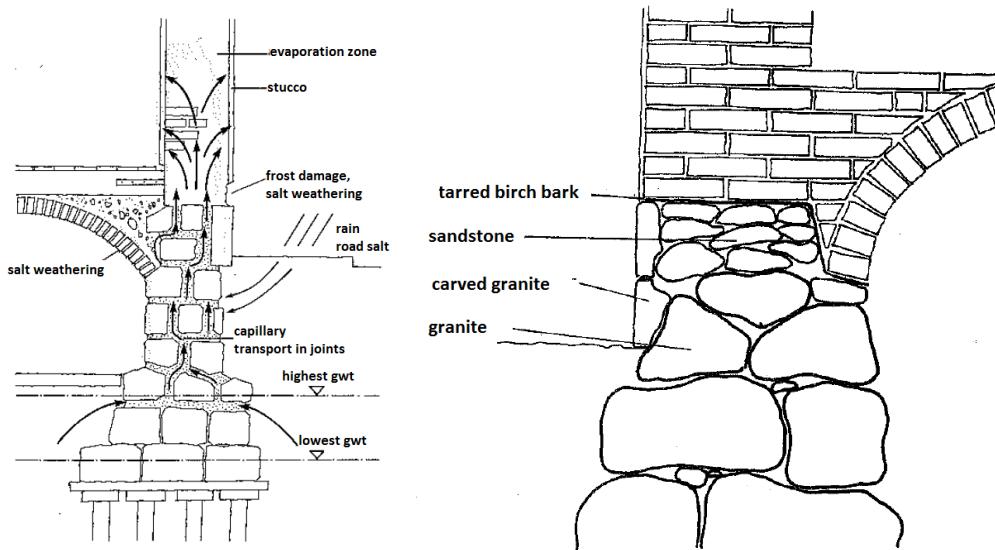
Left: Section through foundation wall transitioning to façade wall, capillary suction transport (Humble, 1990). Right: Section through foundation wall transitioning to façade wall (Eriksson and Hansson, 1974).
